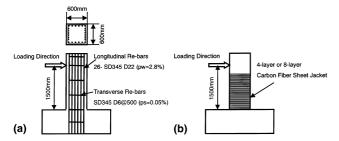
Details of the cyclic loading test speciments for cap beams by carbon fiber sheets: (a) as-built specimen and (b) 4-layer or 8-layer retrofit specimen.
